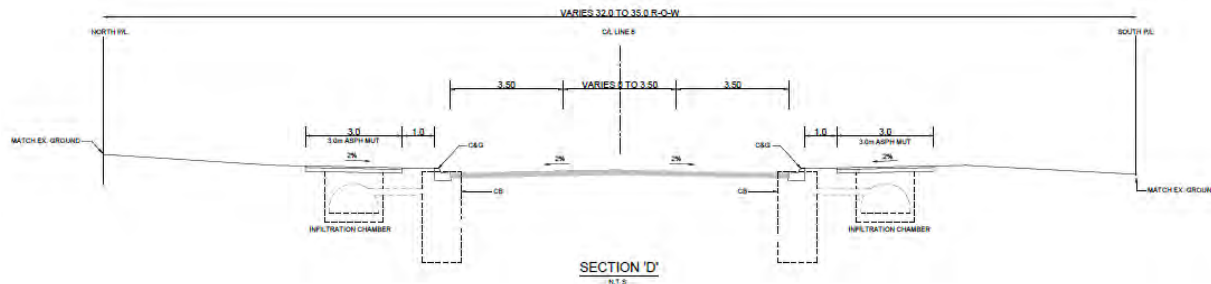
Proposed Line 8 Cross Section with Infiltration/Filtration Chambers
